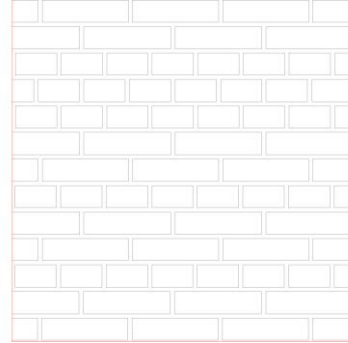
Closing-up bricks arrangement – pointed as the best.
